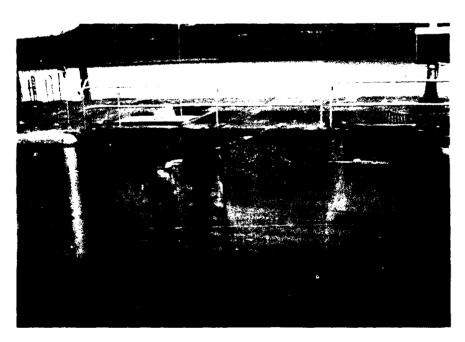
Top of upper guard wall joint between monolith No. 8 and No. 7
